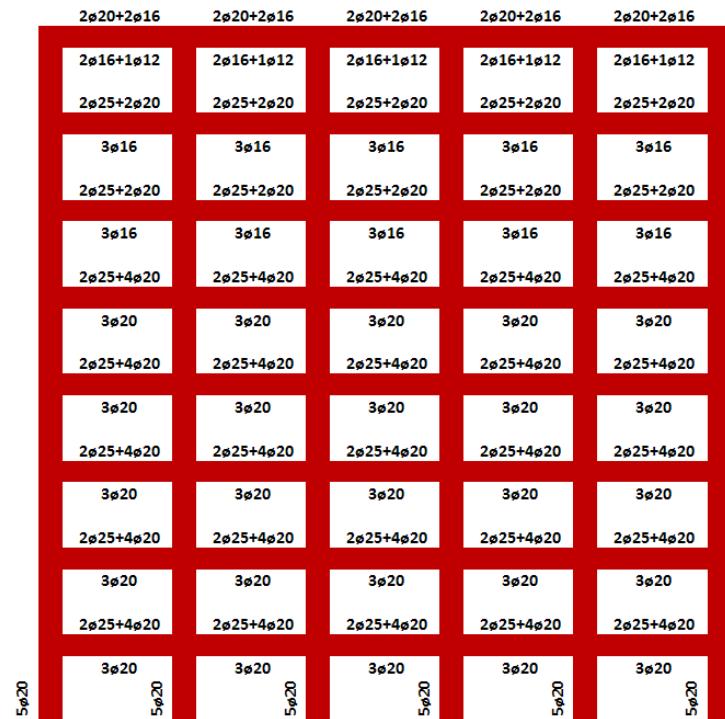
Dimensions of the frame elements, 6 storied structure
